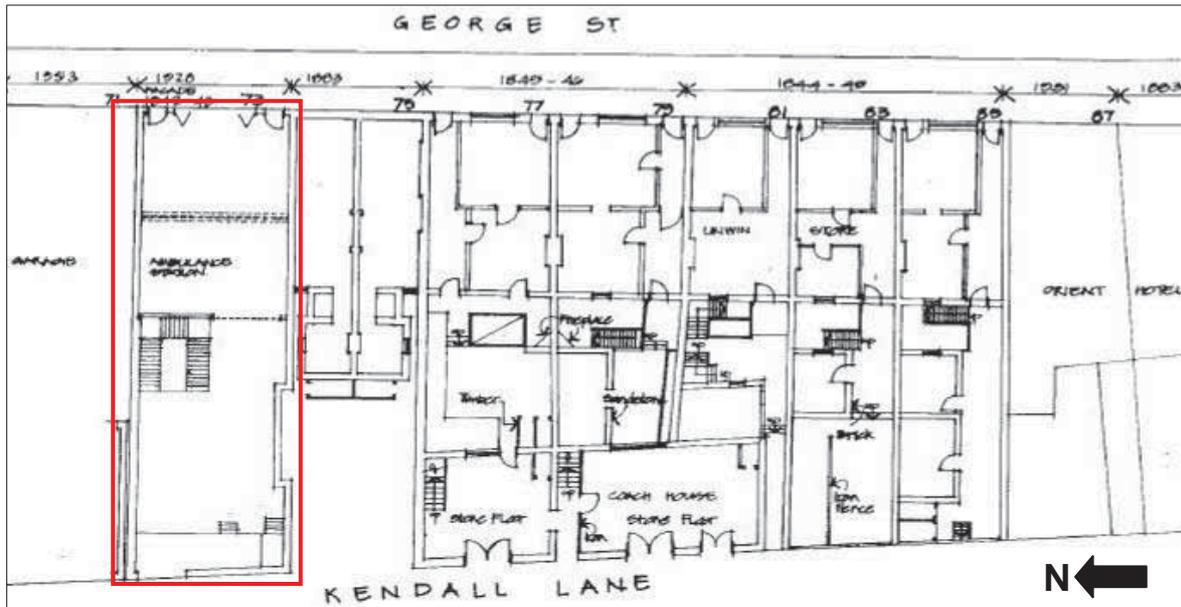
1972 Ground floor plan of the buildings known at this stage as the Kendall Lane Precinct. Note the shared walls and the additional walls in the area of the subject site.
